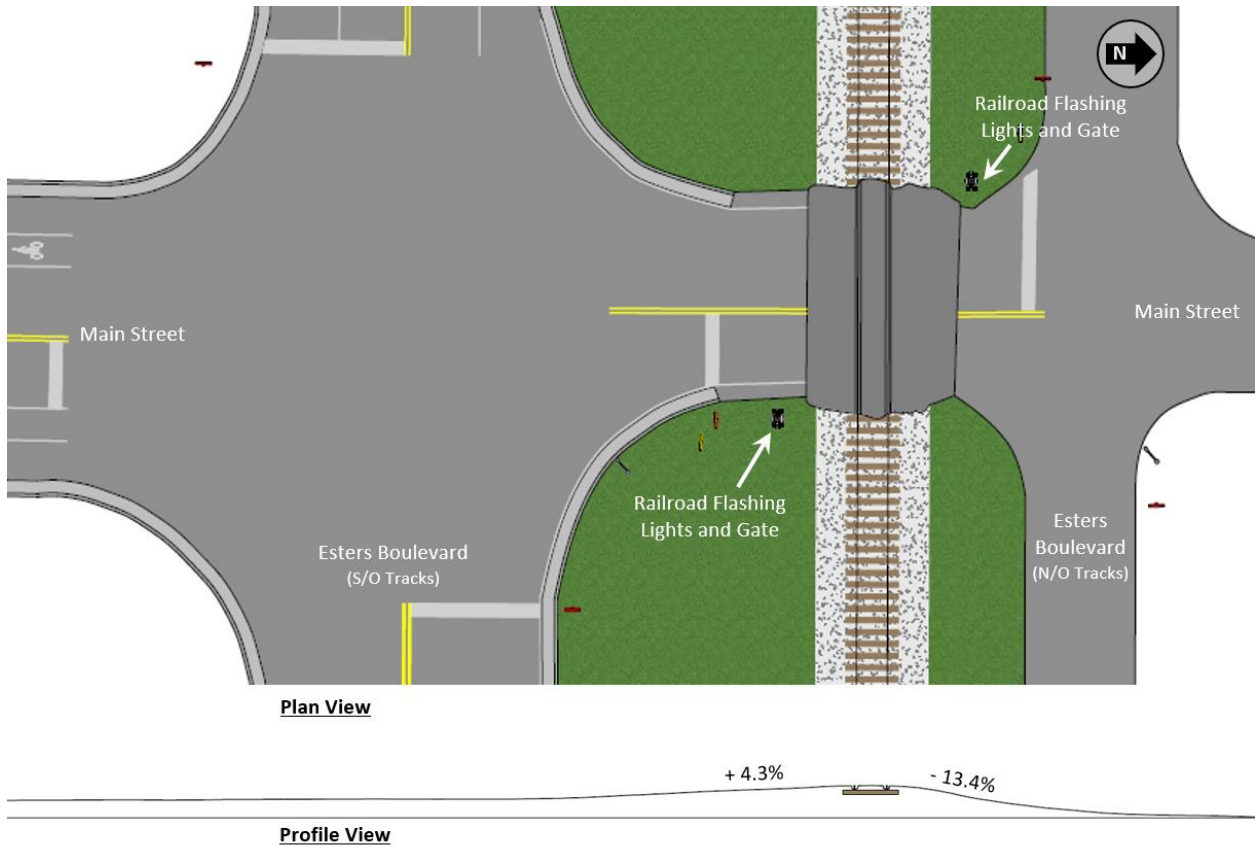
Plan and Profile Views of Main Street Grade Crossing
